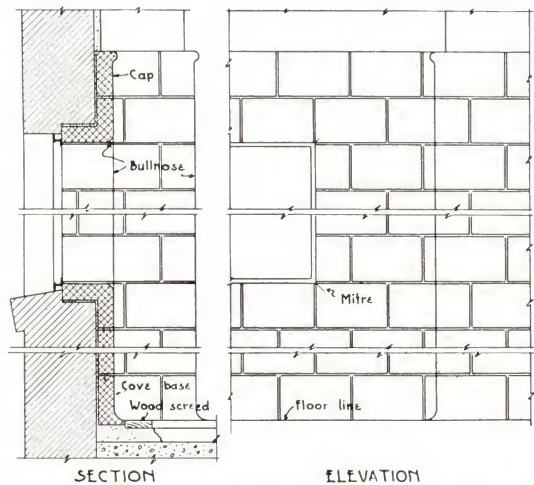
Cross section and elevation drawing showing the construction of glazed brick interior wall facing.
